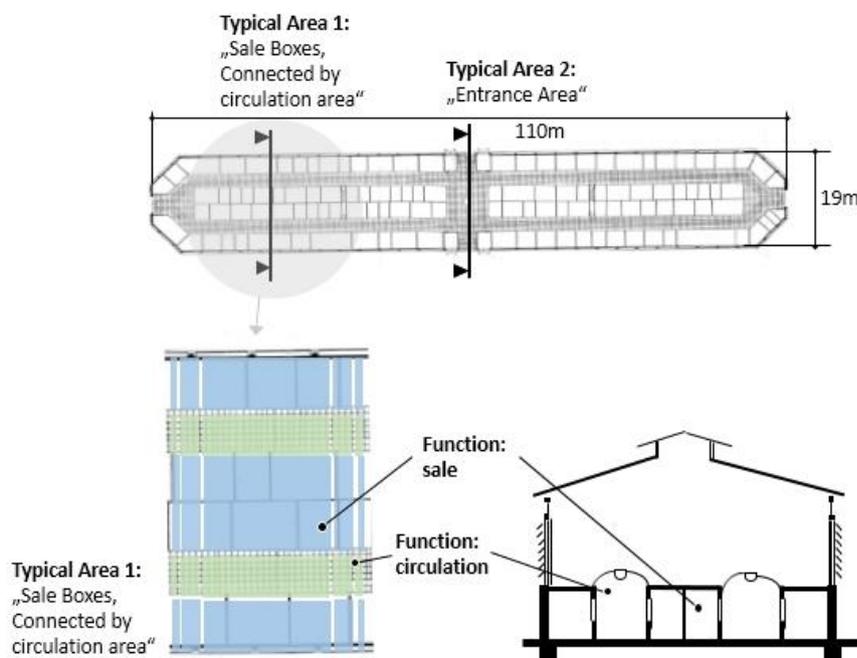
Typical areas for old market hall layout and condition (state after refurbishment in year 1983), typical area 1 will be discussed in detail.
